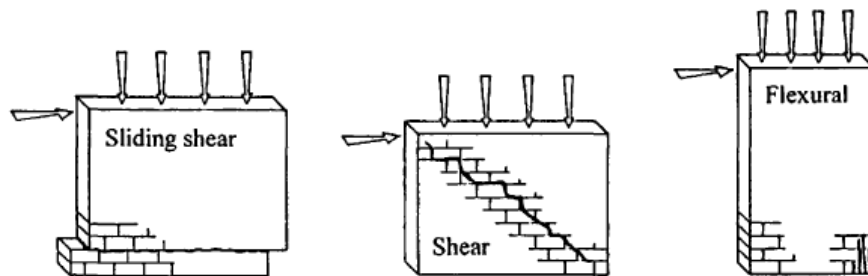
Typical Failure Modes of Masonry Walls subjected to In-Plane Seismic Load (Tomazevic, 1999)
